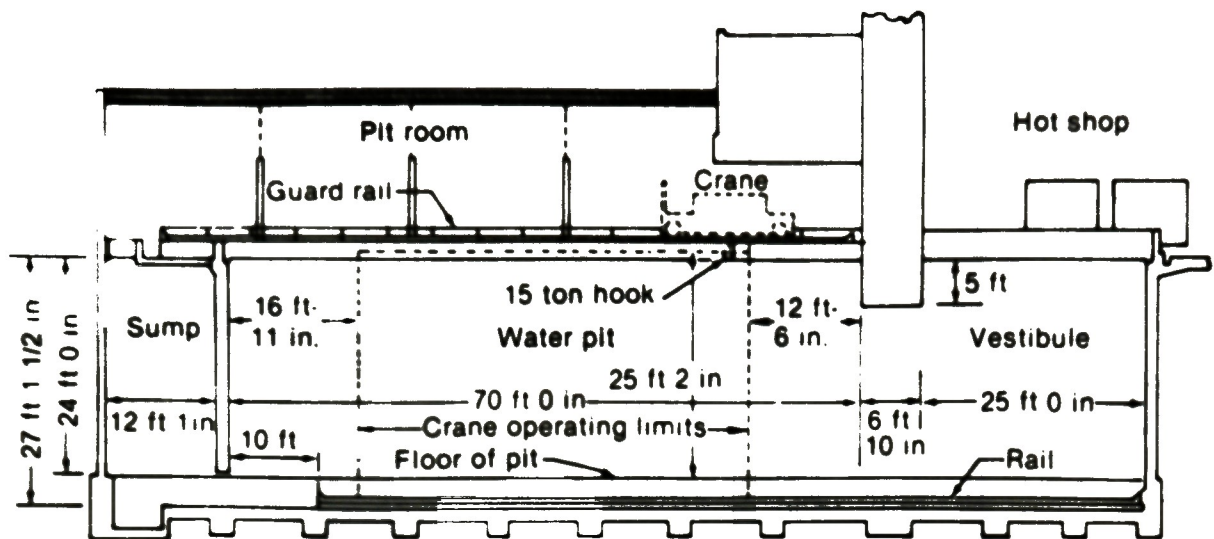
Plan of Water Pit adjacent to the TAN-607 Hot Shop.
